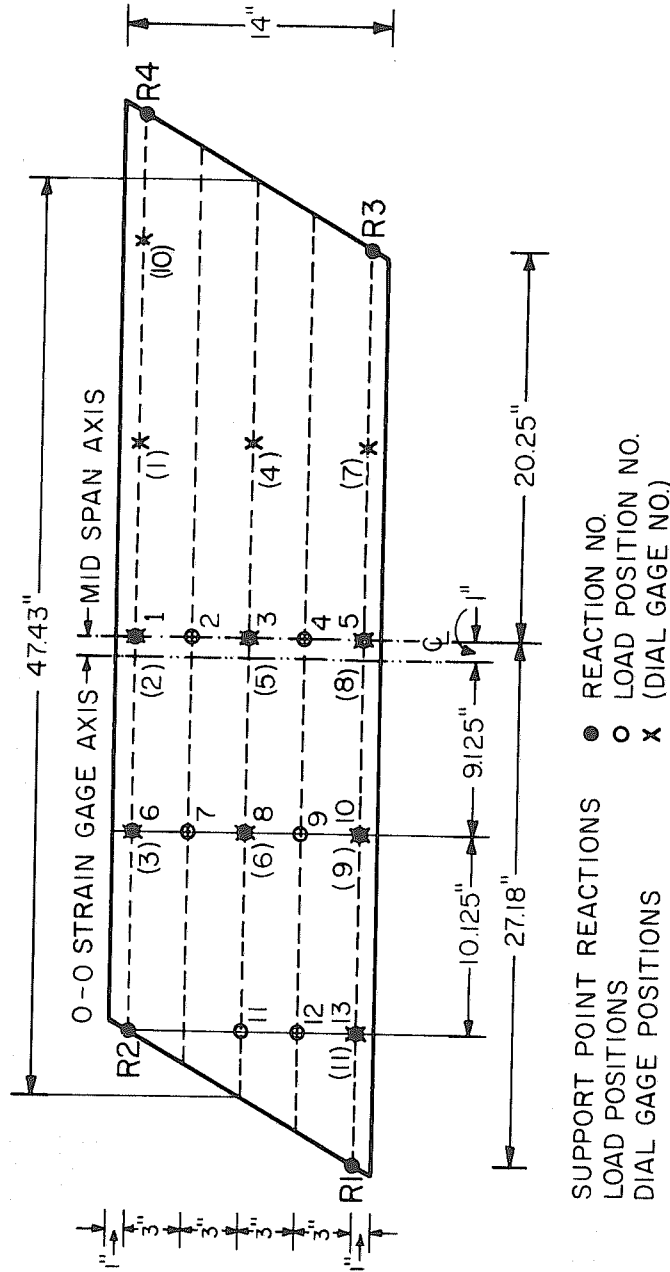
SKEW BOX GIRDER BRIDGE MODEL NO.2,
